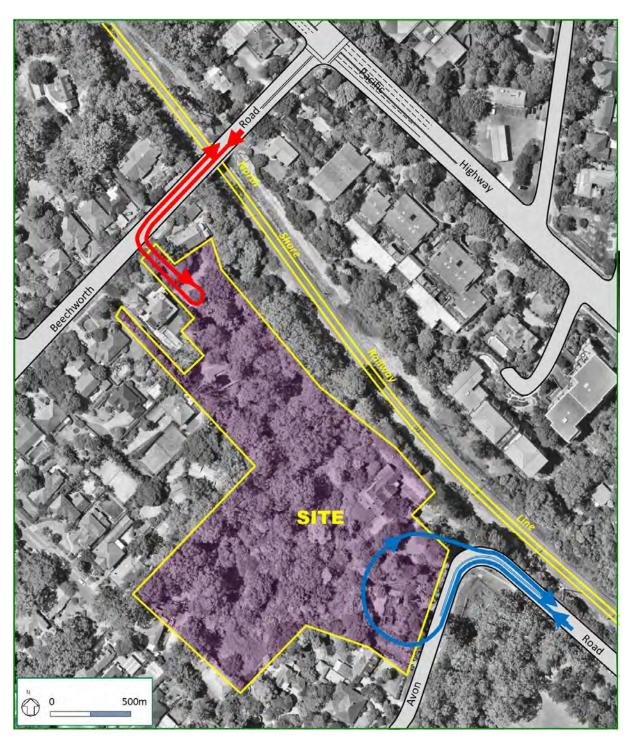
Construction Management Plan – Demolition & Excavation Stage
